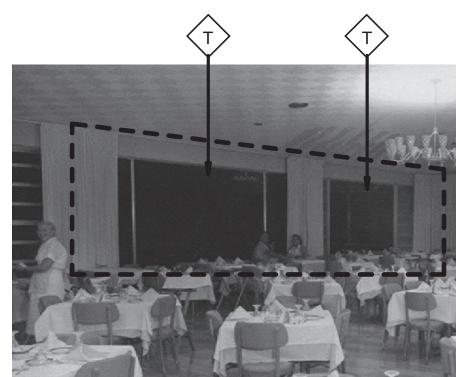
DINING ROOM ON SECOND FLOOR (1959)
